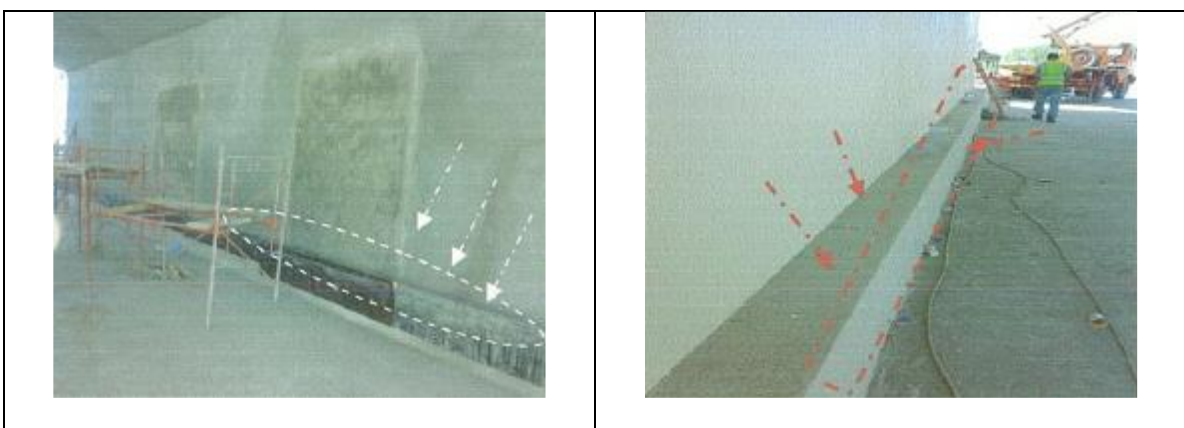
Plywood form for shoulder and shoulder after finish
